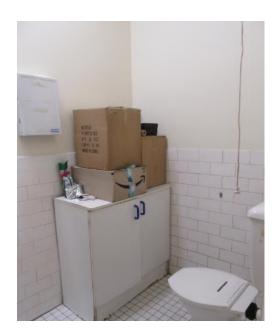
Bathroom (G.16) to the shop at 141 George Street. West of the western wall bounding G.15 and G.19, the fabric of 139–141 George Street generally dates from the 1980s or later. Source: TKD Architects 2020.
